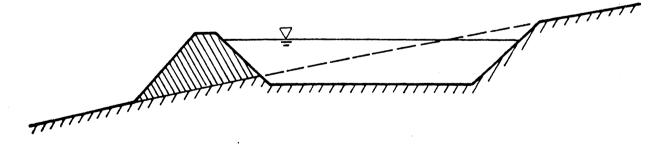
TYPICAL POND CROSS-SECTIONS ON HIGHLY SLOPED LAND.
